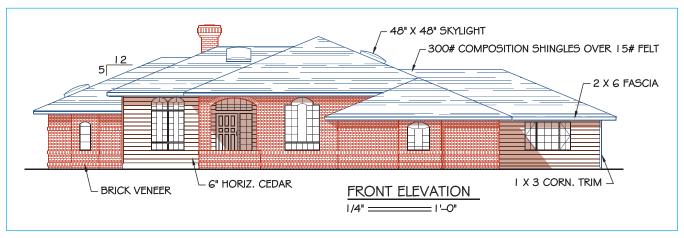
Based on preliminary floor plans, the front elevation is drawn to explore design options.
